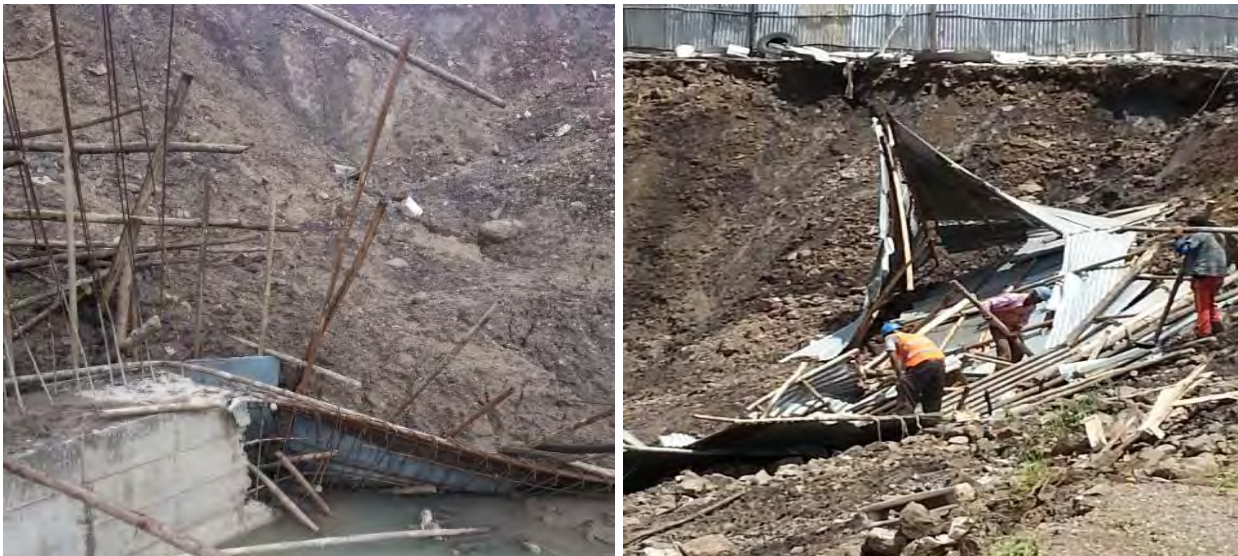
(A) Sliding of ground due to wrong calculation of earth pressure
